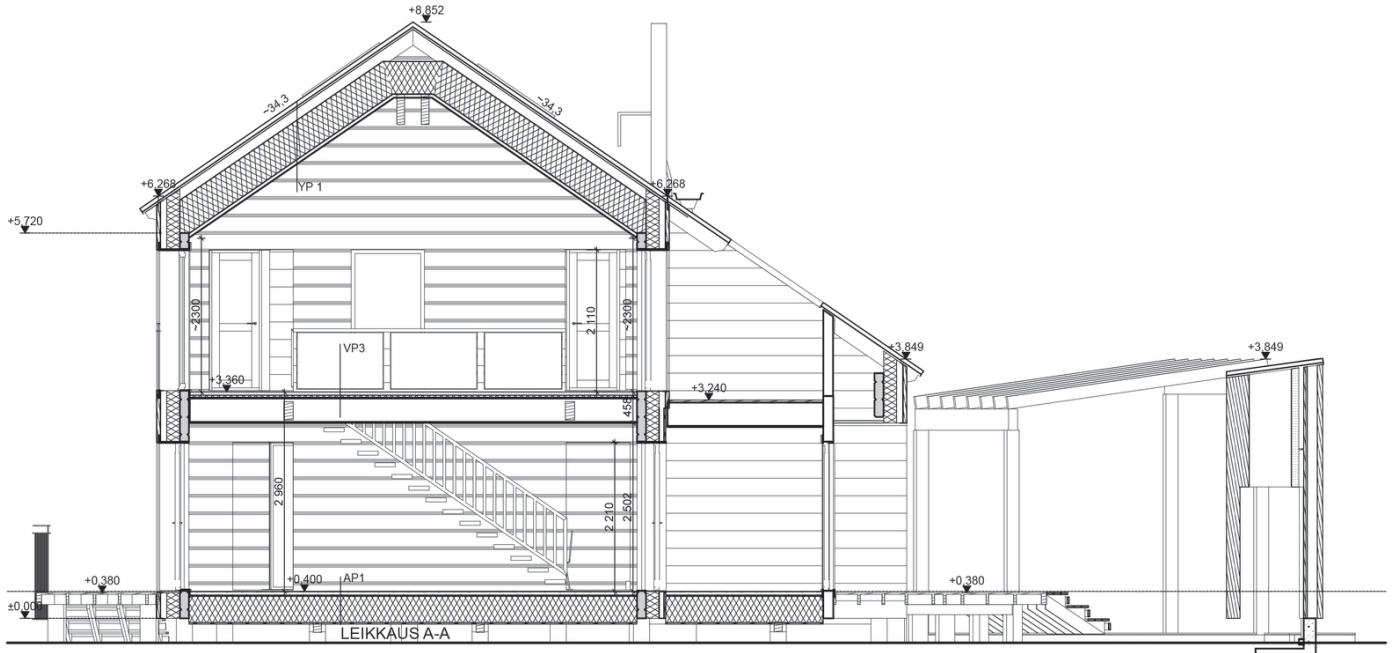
| BUILDING SECTION, PHOTO CREDIT | ARCH DAILY
